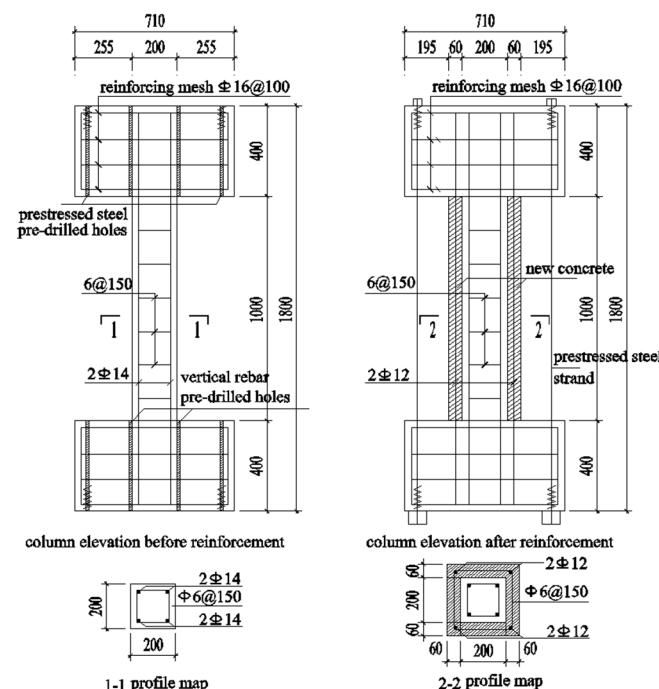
Cross-sectional dimensions and reinforcements of the test specimen.
